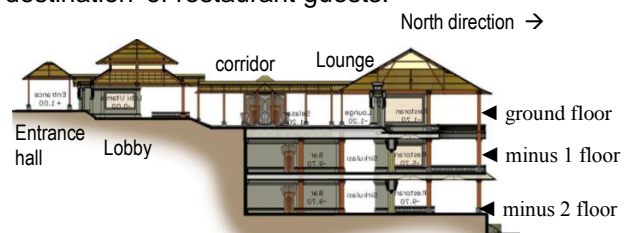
Drawings of Entrance hall - Lobby - Hallway and Lounge - three-storeyed Restaurant Sections of the building towards the South - North (Source: author 2019)
